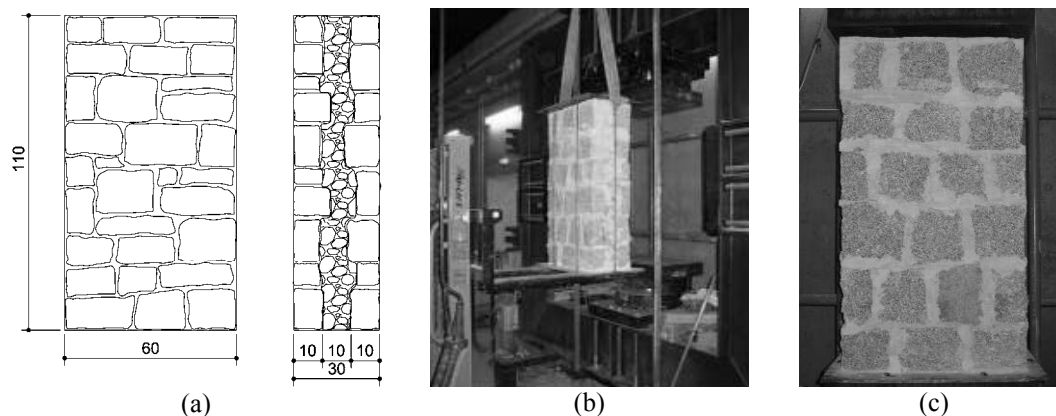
Three-leaf wall specimens: (a) schematic geometry (units in *cm*); (b) ; transport of the wall to the testing frame; (c) wall before testing.
